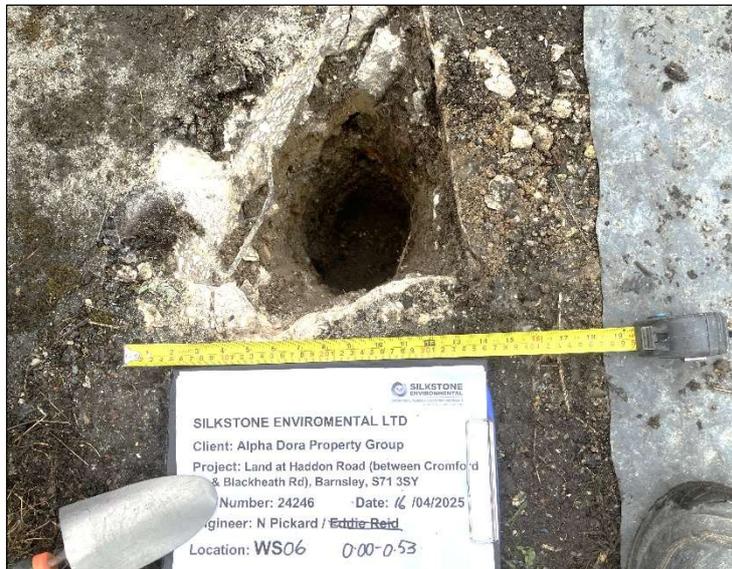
16/04/2025 WS06 – Hand dug inspection pit.
